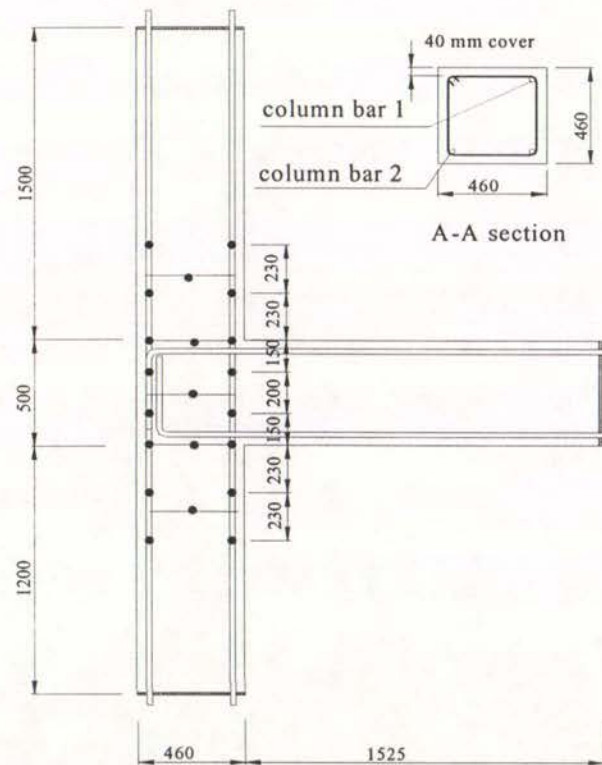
Arrangement of Electrical Strain Gauges for Interior Beam-Column Joint Units
